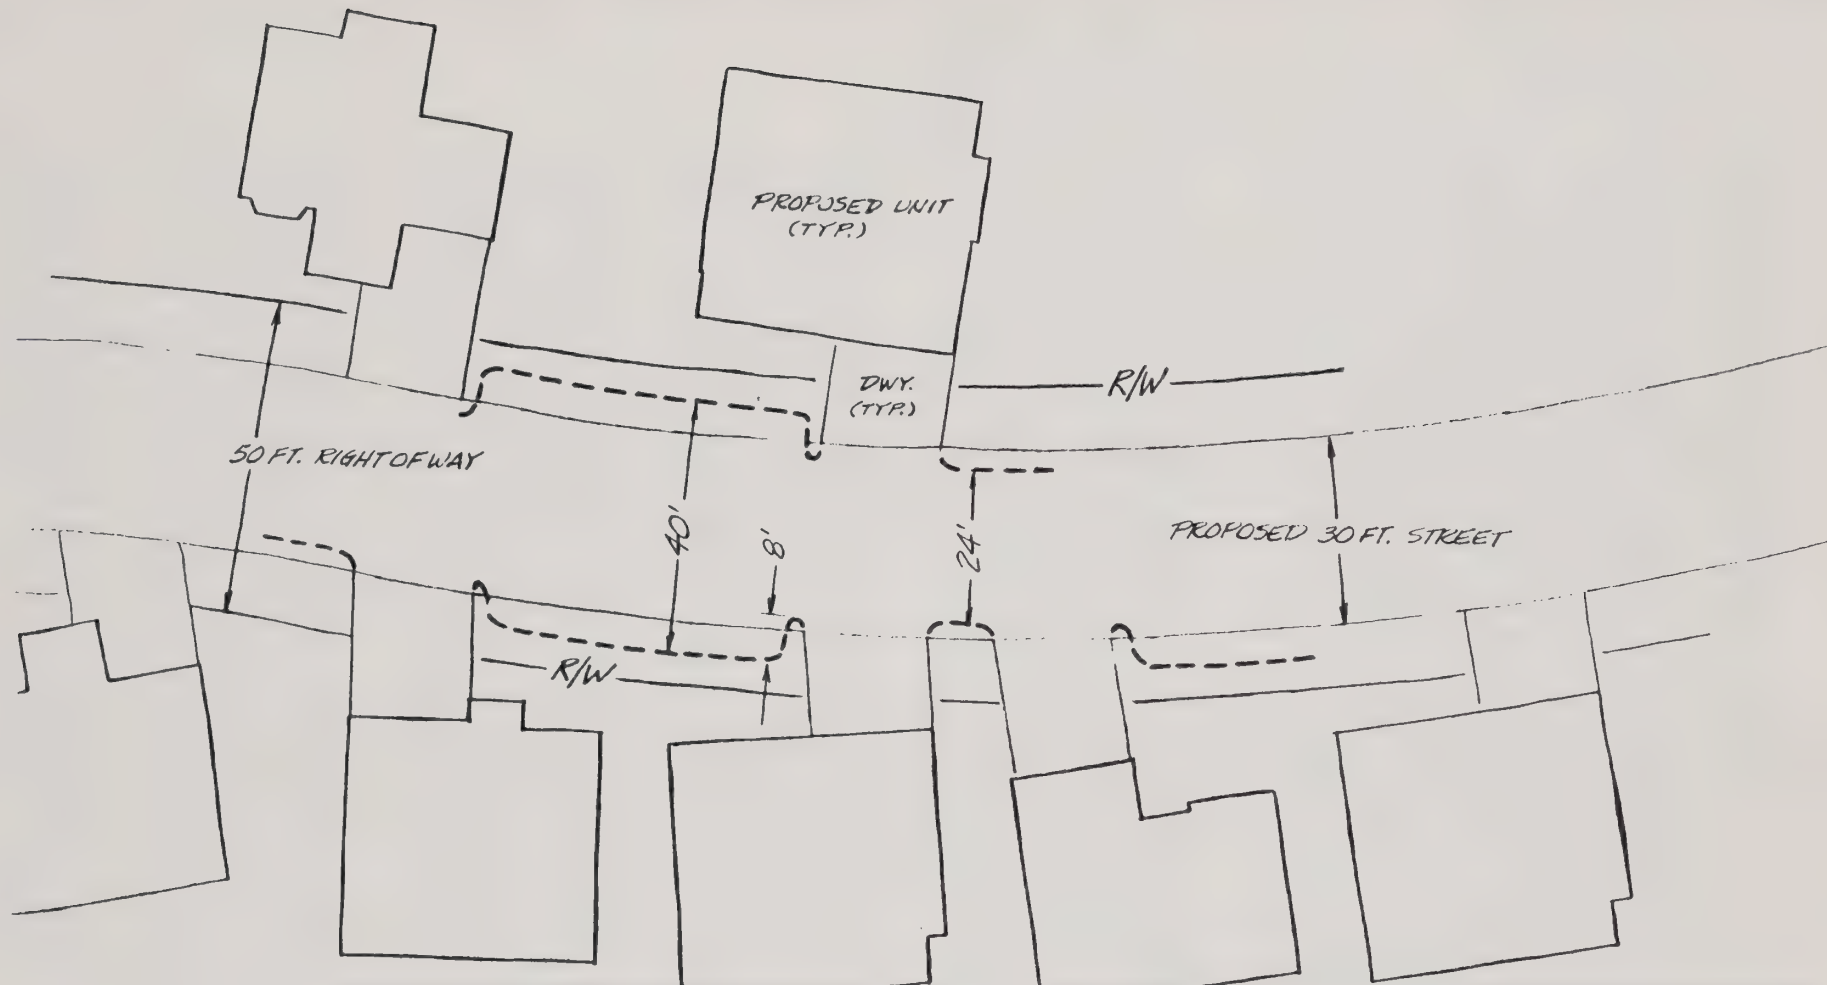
PARALLEL BAYS FOR ON-STREET PARKING
